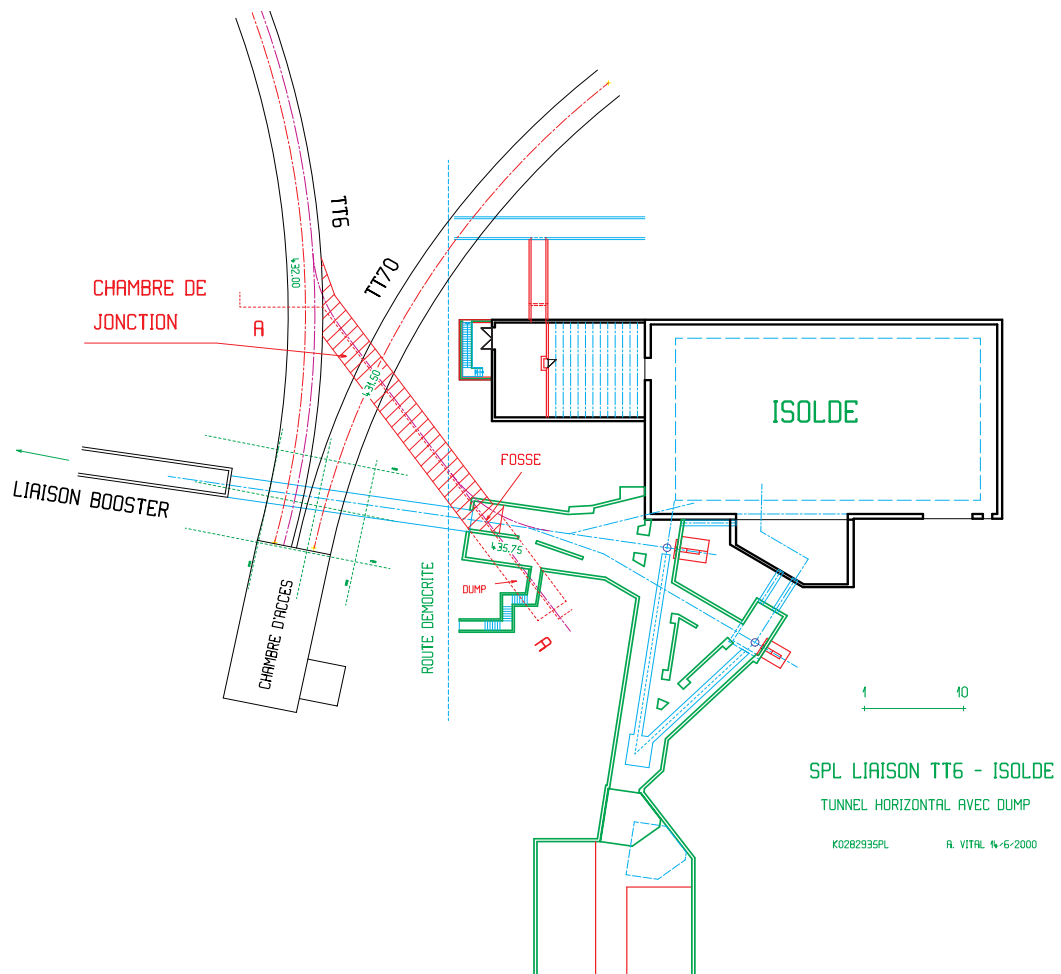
Connection of the transfer tunnel to ISOLDE, plan view.
